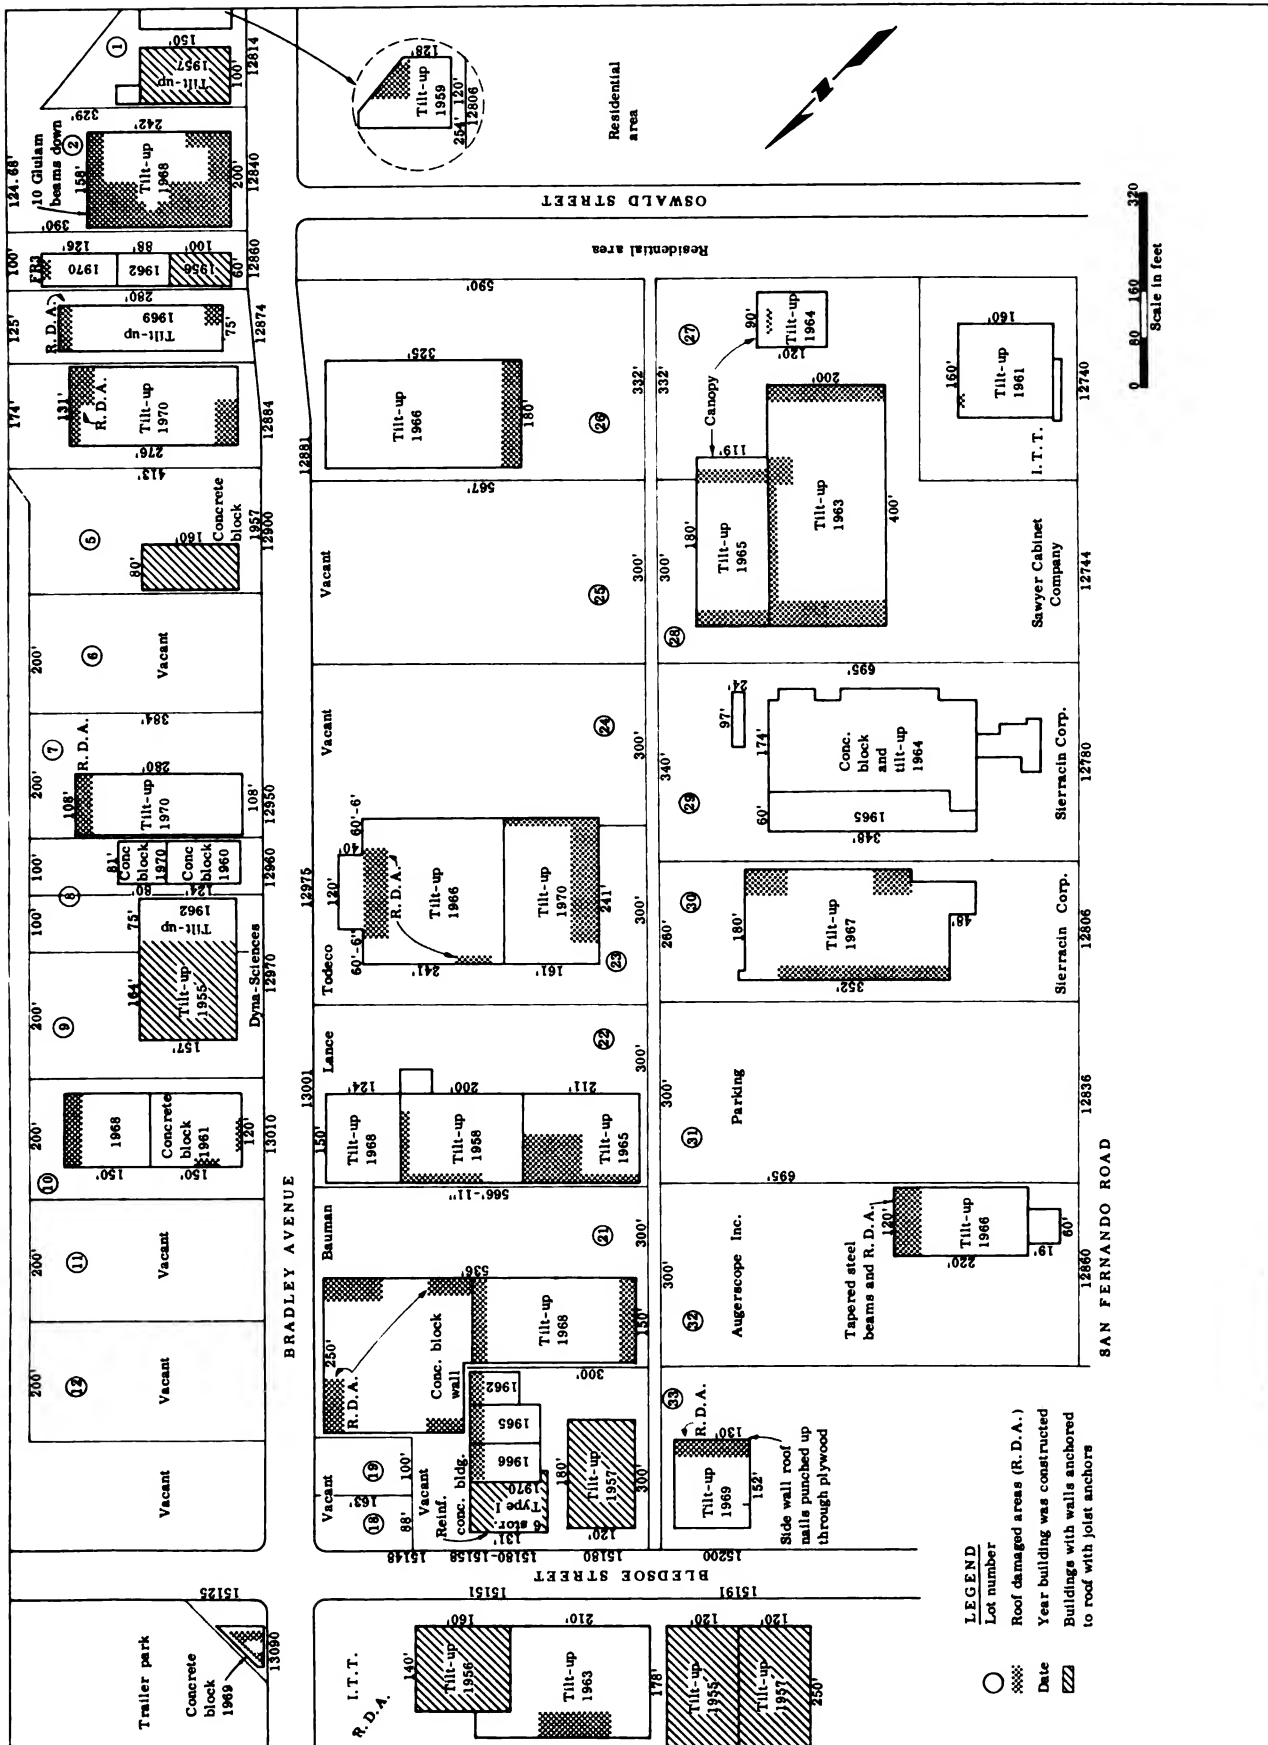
Map of Sylmar industrial tract showing buildings in which roofs collapsed or separated from walls.
